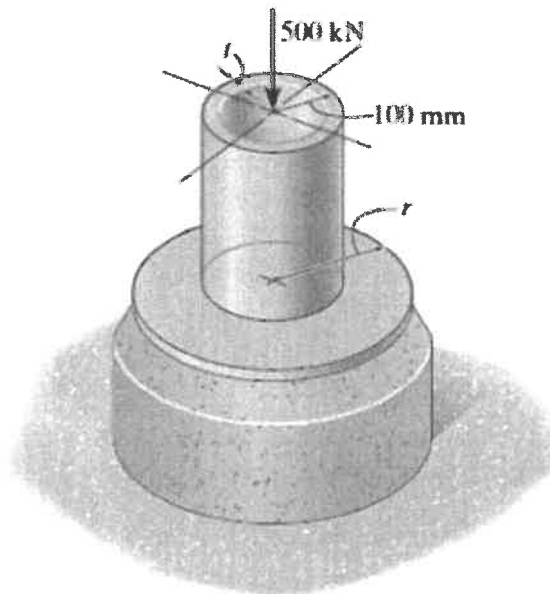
Loaded vertical pipe on steel base plate and concrete pedestal
